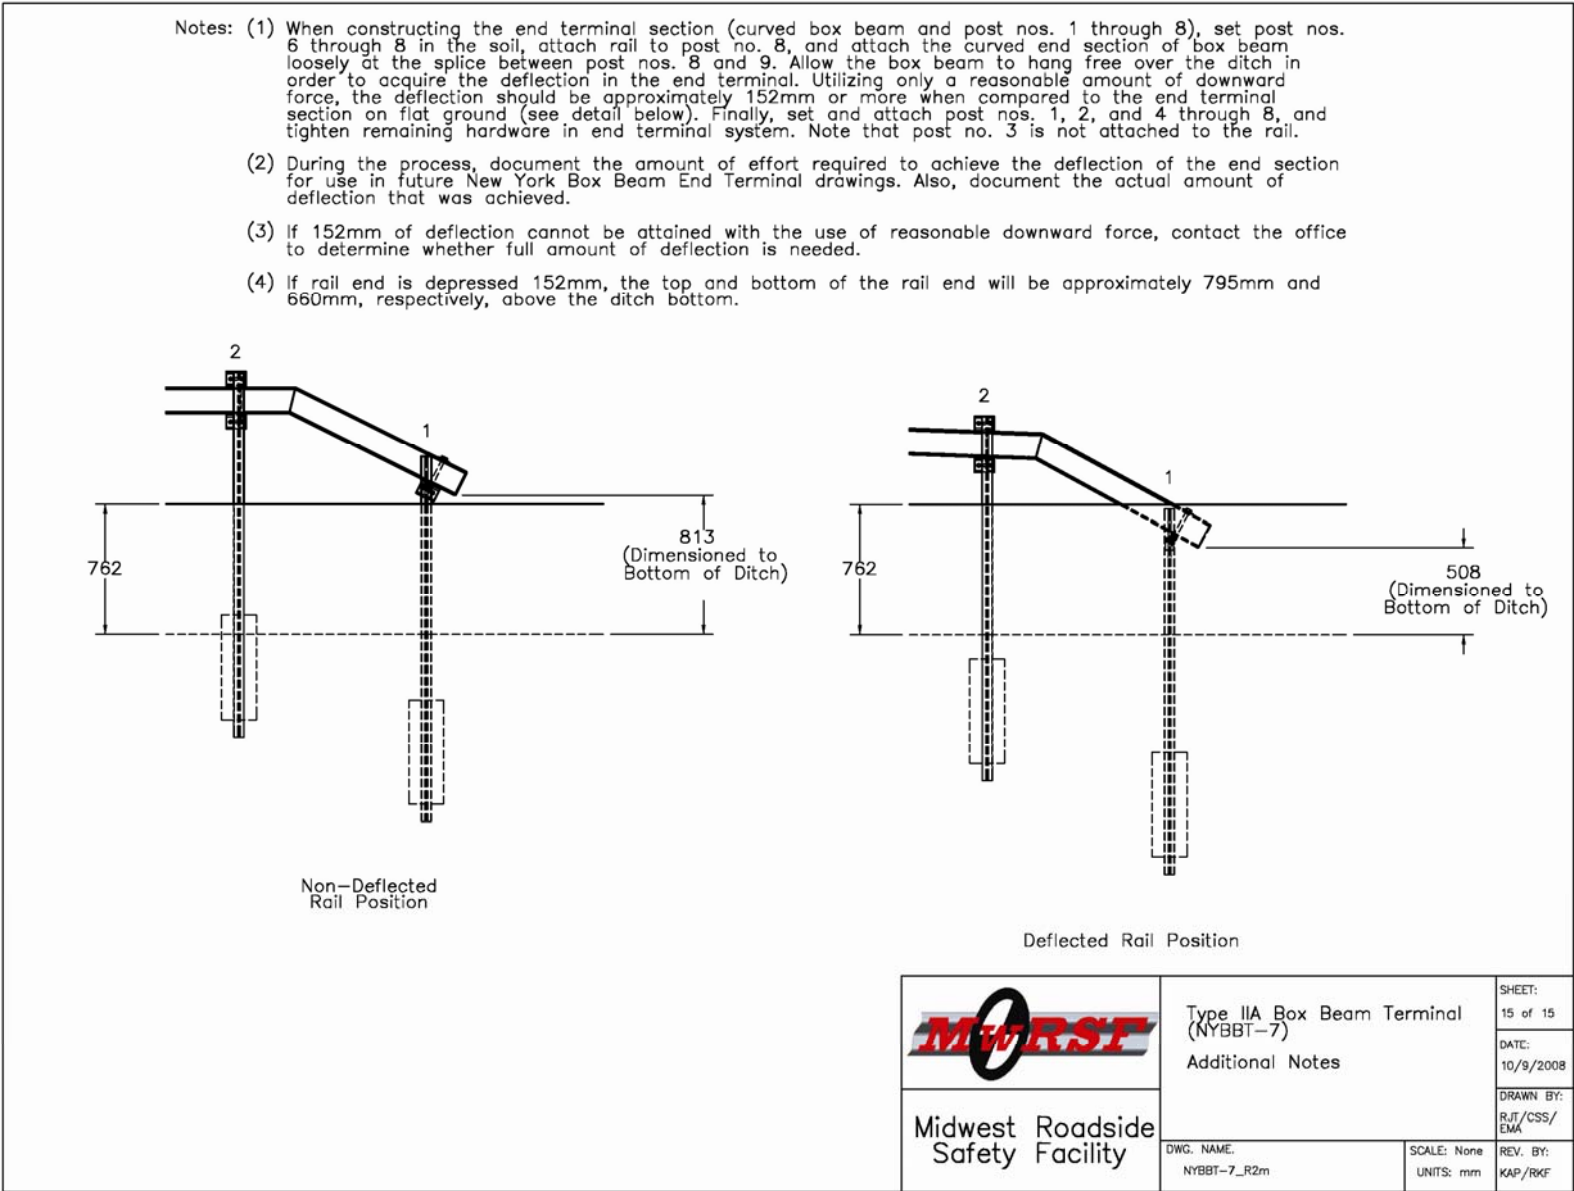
Modified Type IIA Box Beam Terminal in Ditch System Details (Metric), Test No. NYBBT-7
